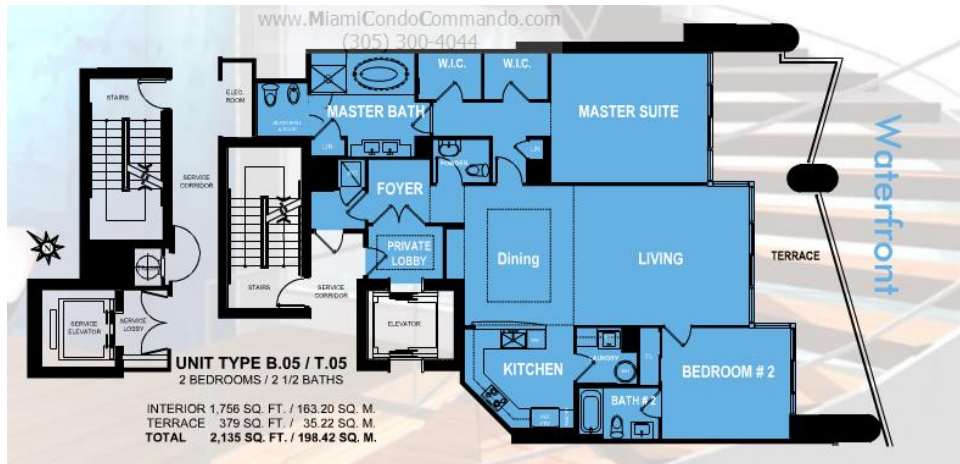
Grovenor House, Floor 17 to 26, Unit type B.05 / T.05 Master Plan [31]
